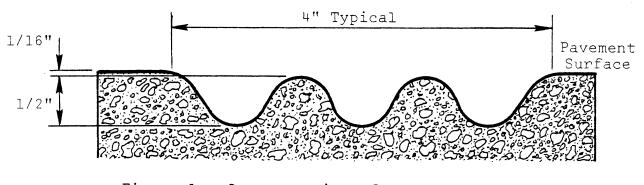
Cross section of groove. Note: 1 inch = 2.54 cm.
